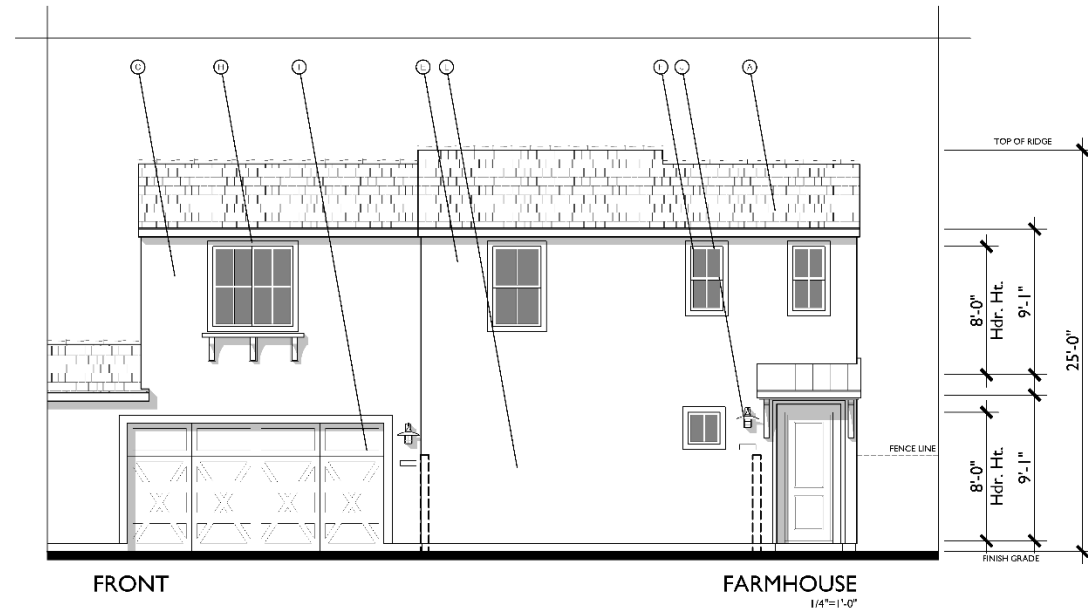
Farmhouse Elevation - Cluster Plan 2
